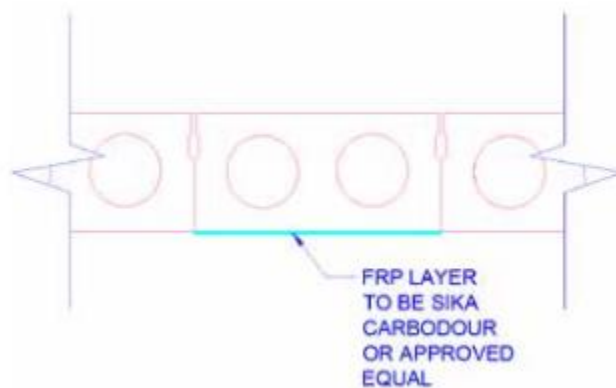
Typical detail of FRP Repair. Beam width is 36-inches. FRP width shall be 30-inches
